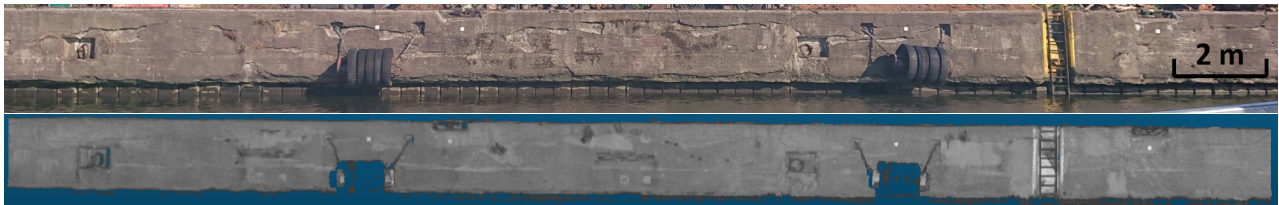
Real dataset in Lübeck city port. The upper row shows a photo of the quay wall and the lower row the corresponding point cloud. Spalling is in the upper part of the quay wall between the fenders.
